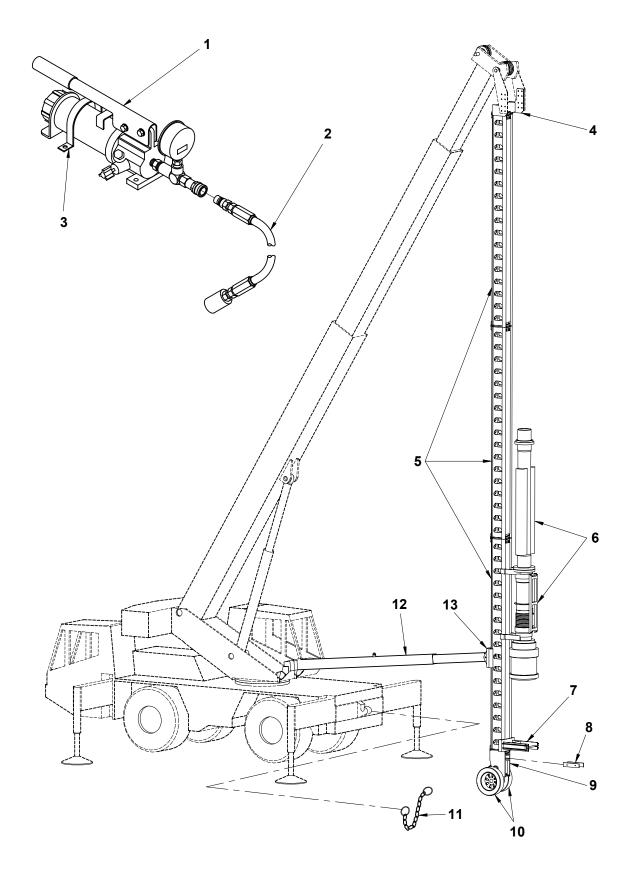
Components of End Item - Berminghammer Pile Driver System (Sheet 1 of 5)
